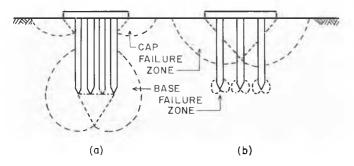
Failure zones at piled foundation: (a) pier failure, (b) individual pile failure.
